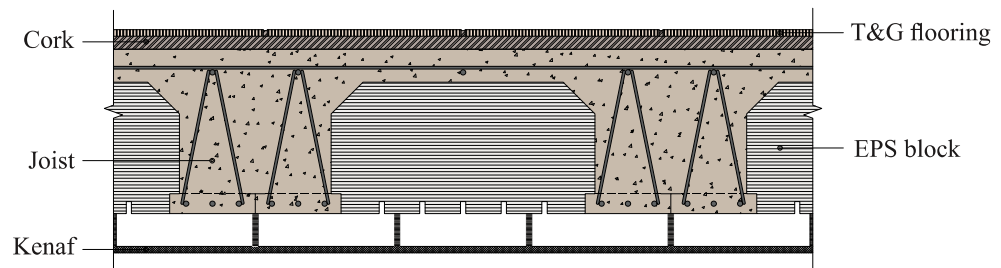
Cross-section details of the floor for the building with sustainable materials.
